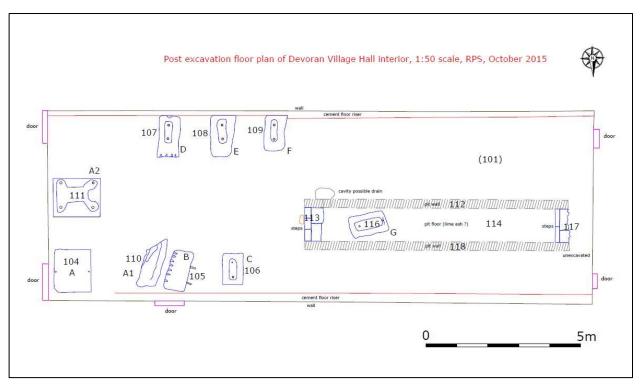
Post excavation plan of Devoran Village Hall, showing inspection pit and large granite blocks or setts.
